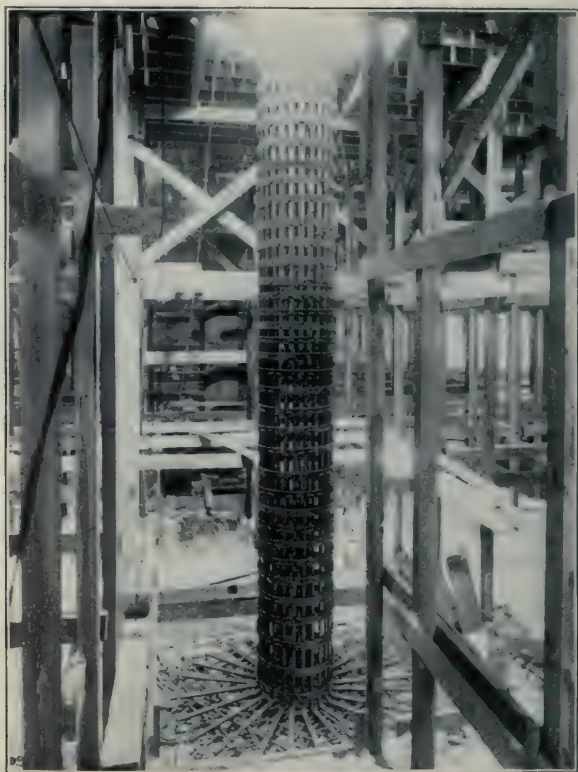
Reinforcement of column in Hamm Brewing Co.'s Stock House. Carrying a load of 1,100 tons. Hoops 27 inches in diameter.
